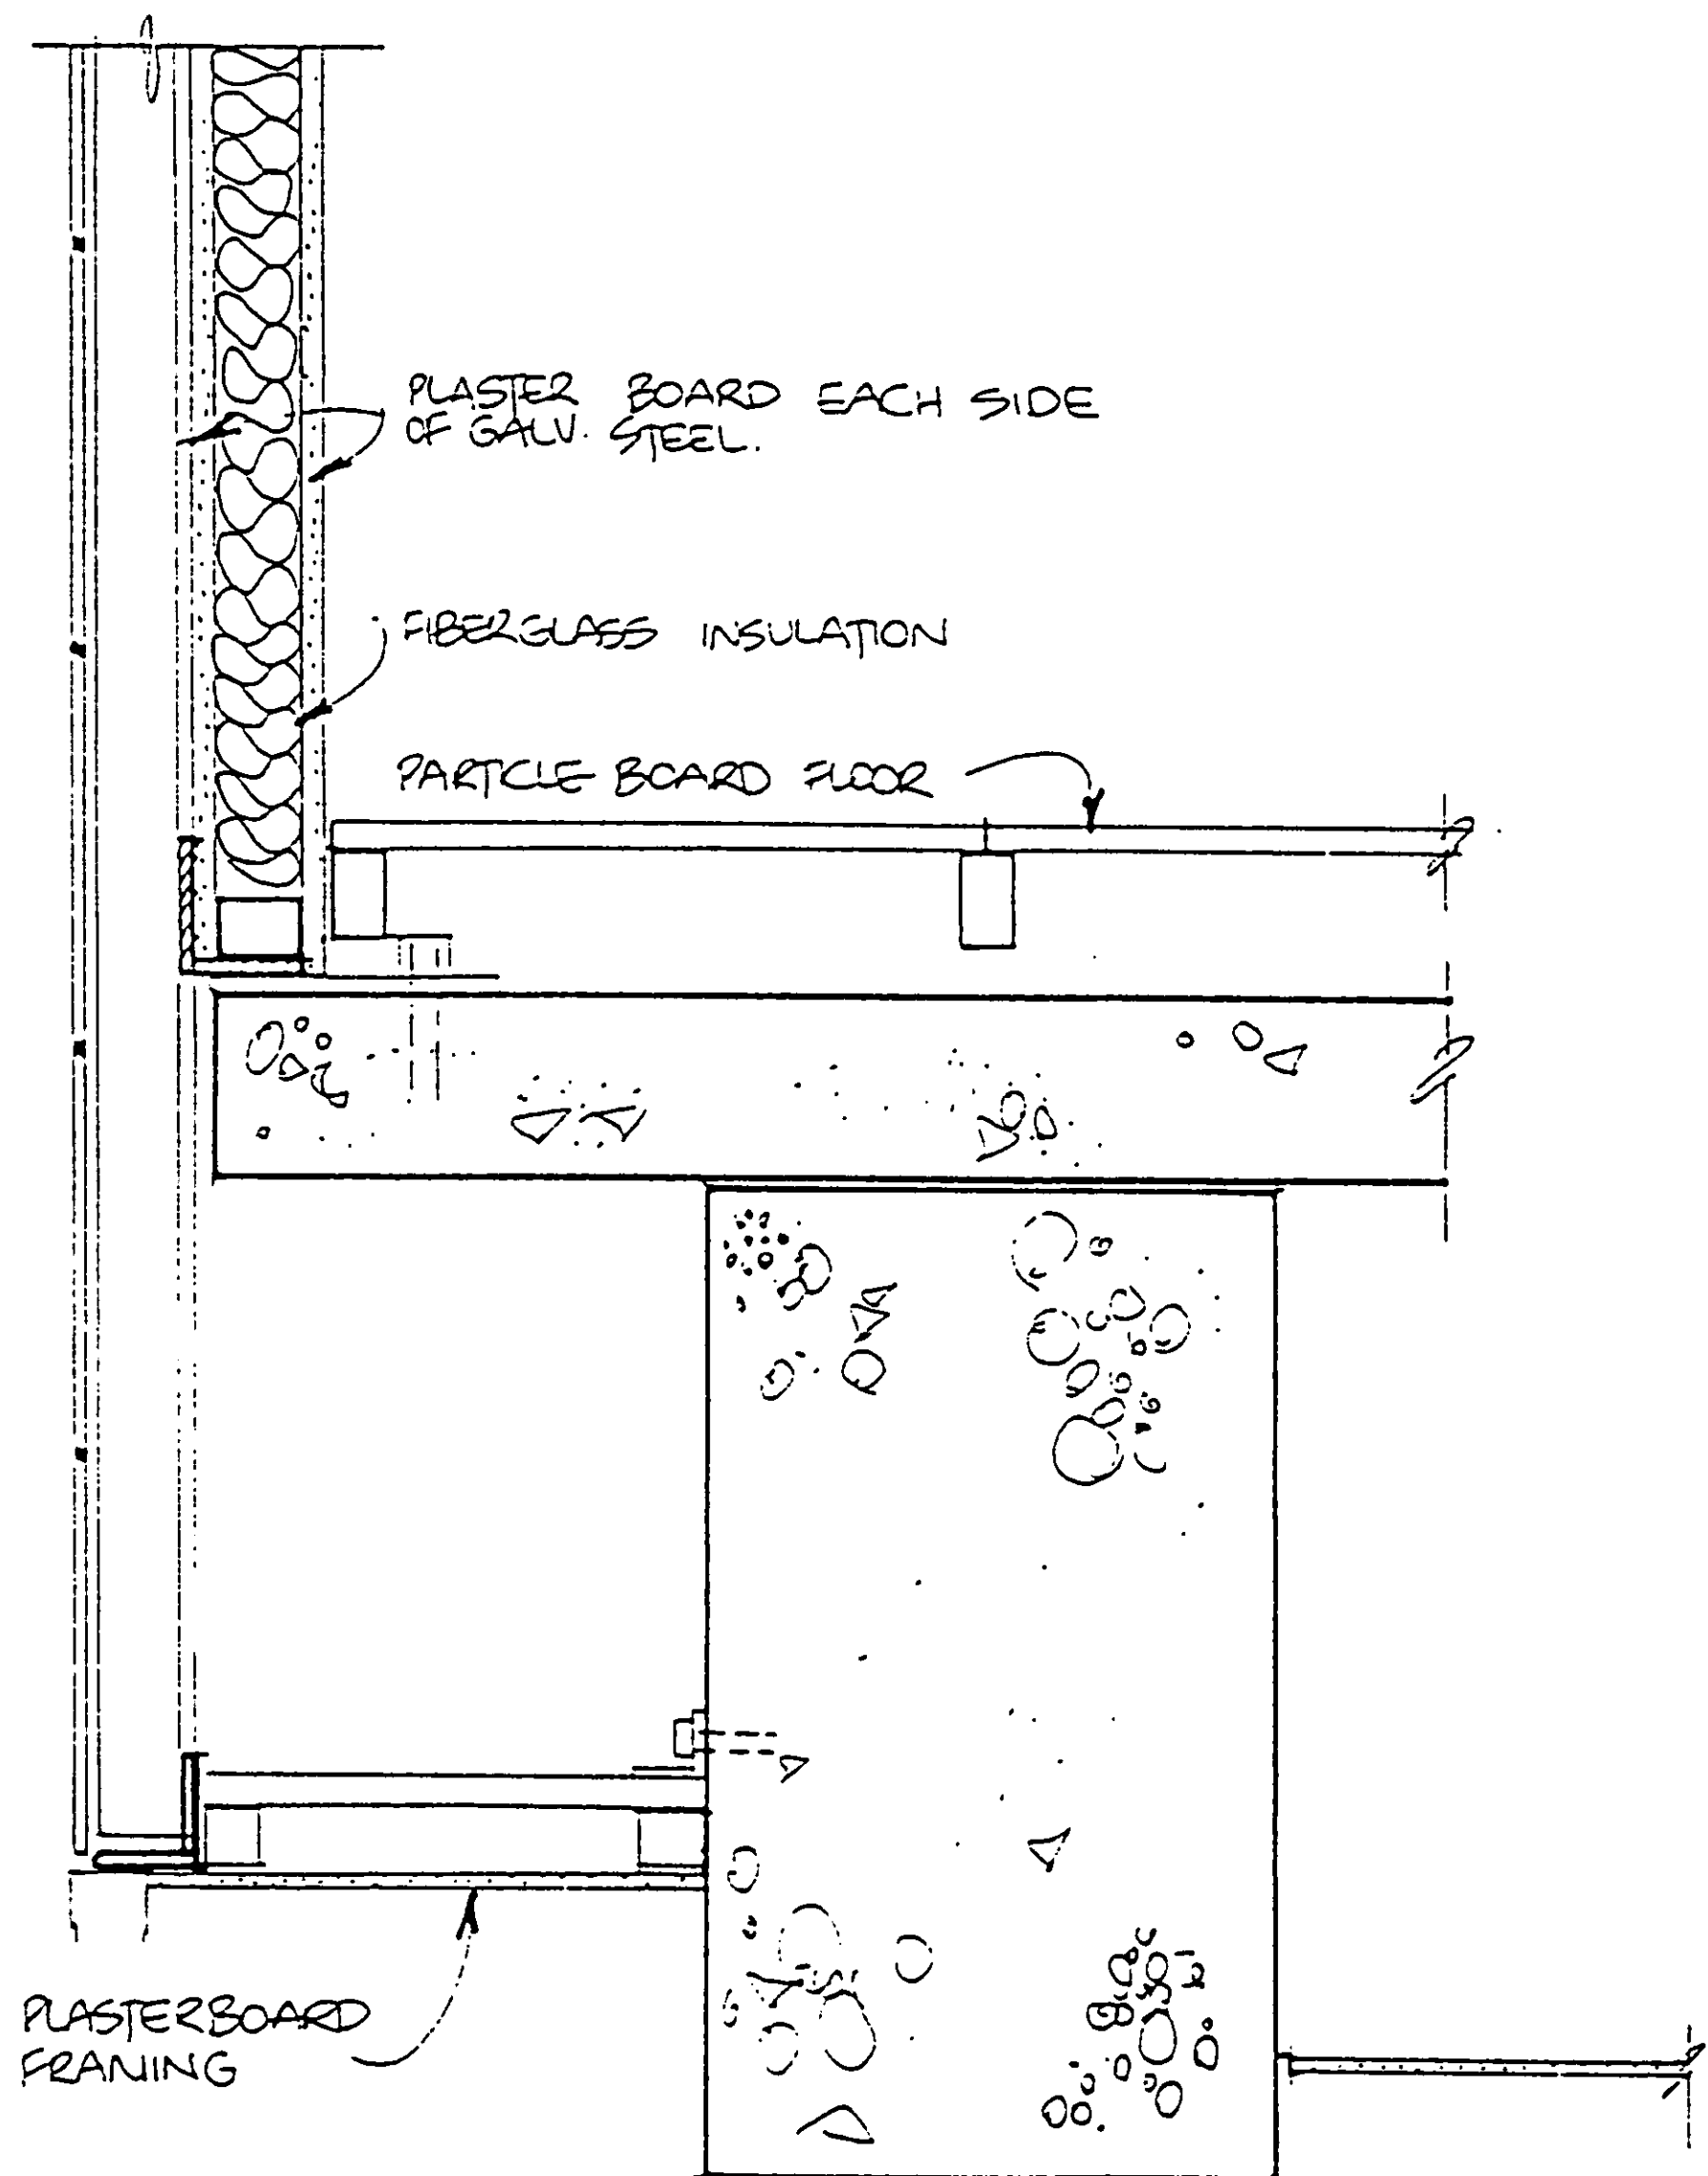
(d): SECTION THROUGH CONCRETE FRAMED, ALUMINIUM AND GLASS CURTAIN WALL BUILDING.
